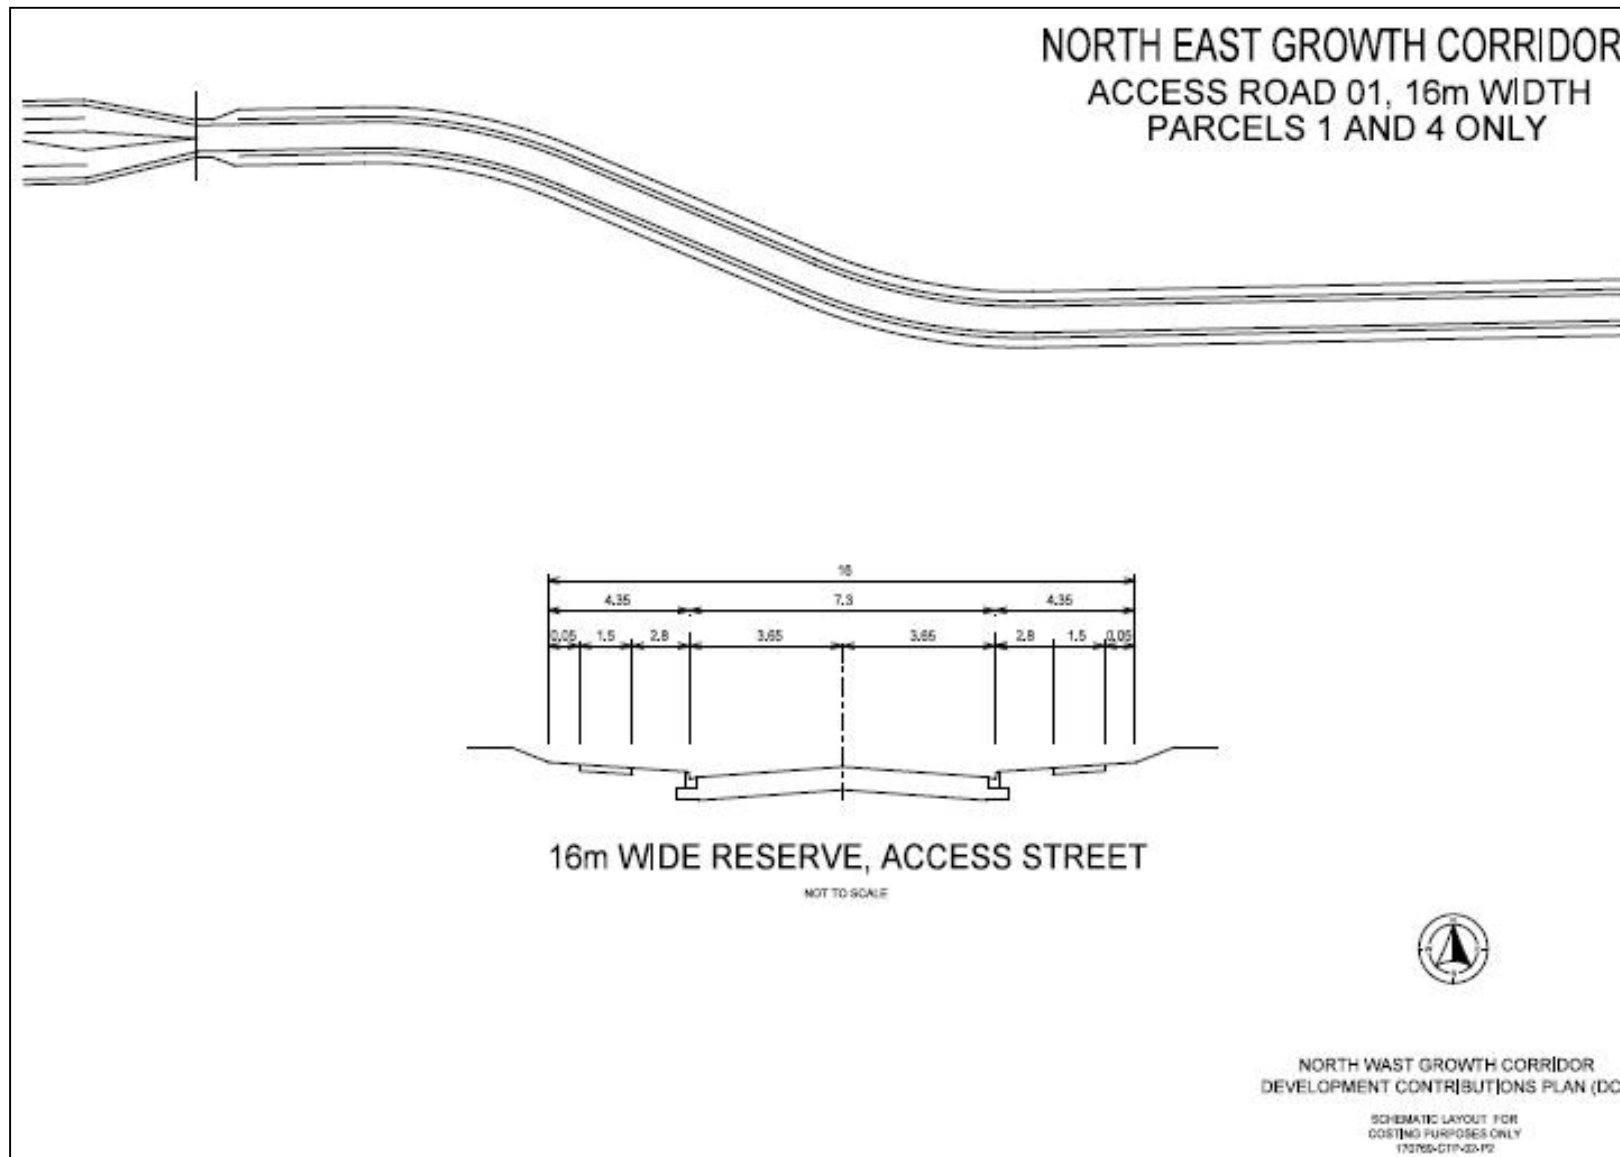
Typical Road Profile for Road-01 – Access Street to serve only Parcels 1 & 4
